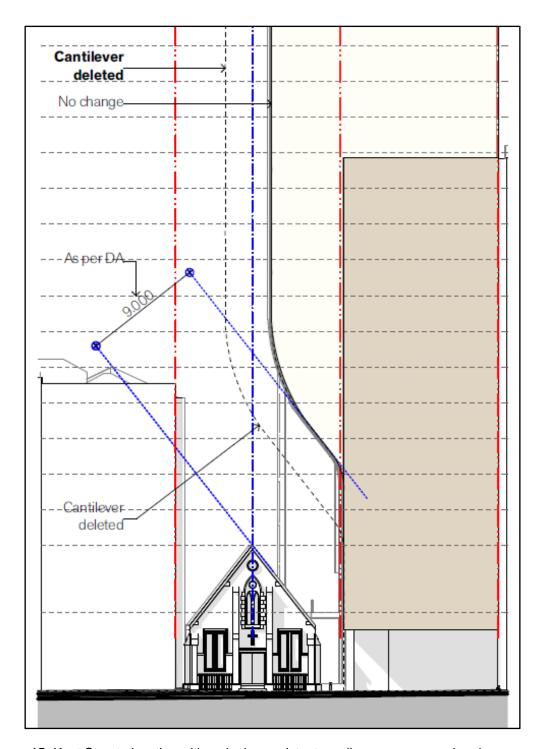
Kent Street elevation with a single consistent cantilever as proposed and recommended by the CSPC.
